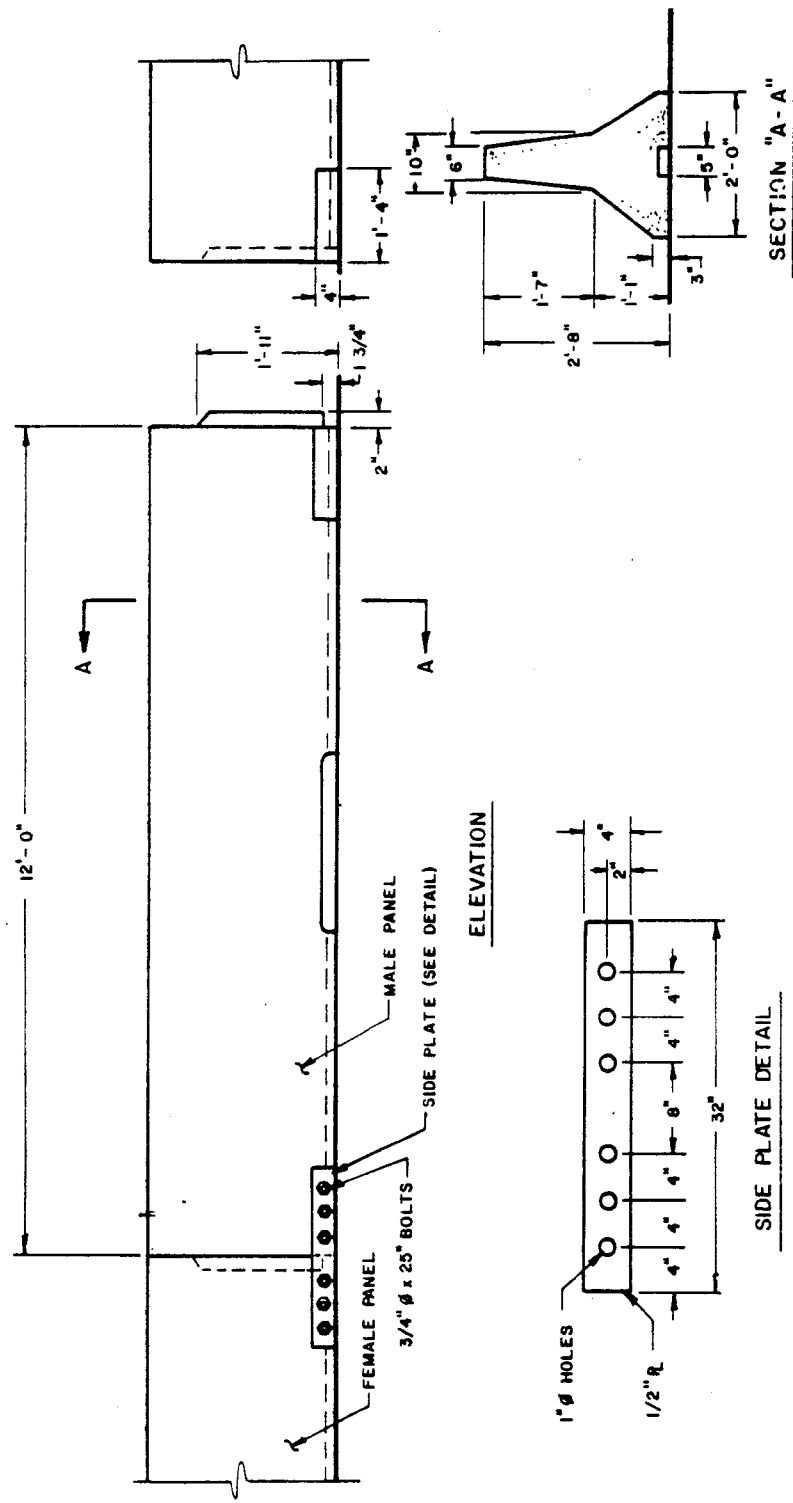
Concrete Median Barrier Detail for Test 3825-7.
